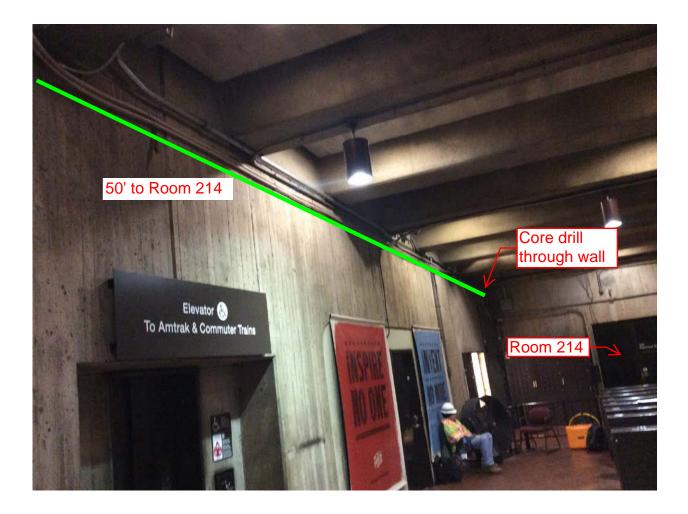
Proposed conduit run along wall to Mechanical Room 214 (core drilll required)
